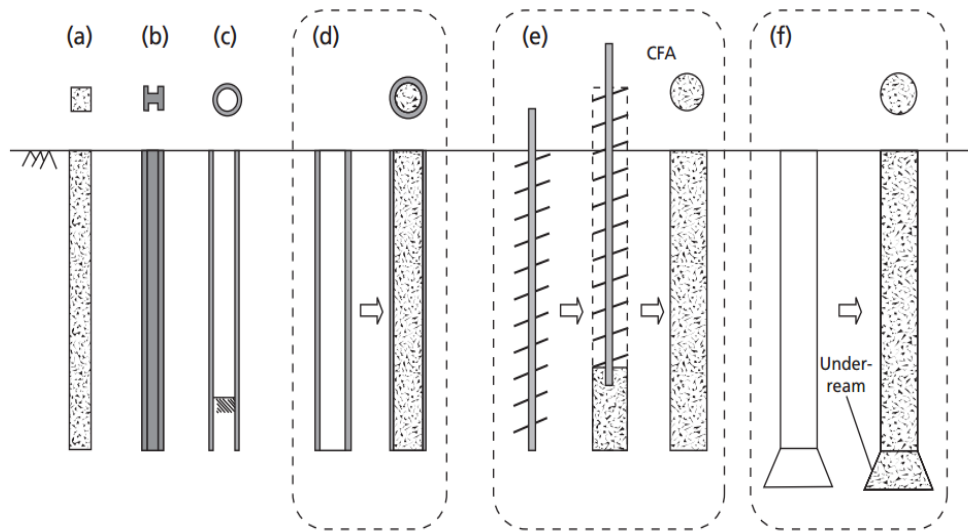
Principal types of pile: (a) precast RC pile, (b) steel H pile, (c) steel tubular pile (plugged), (d) shell pile, (e) CFA pile, (f) under-reamed bored piles (cast-in-situ) (Source: Knappett & Craig, 2012)
